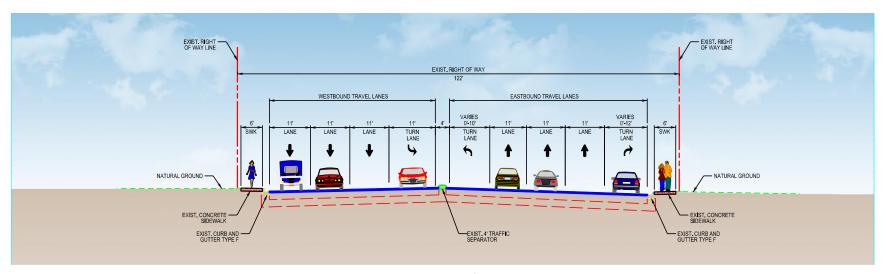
Typical Section - Lantana Road from High Ridge Road to Sunset Road
